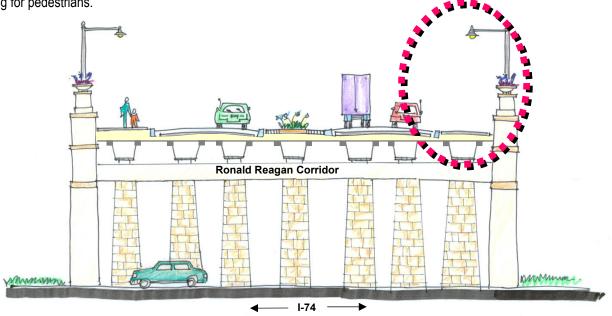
Bridge Treatments-Cross Section of Corridor
